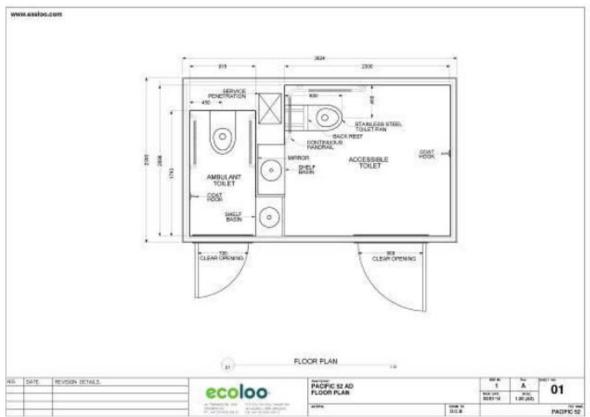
Typical floor plan of Ecoloo Pacific Twin
